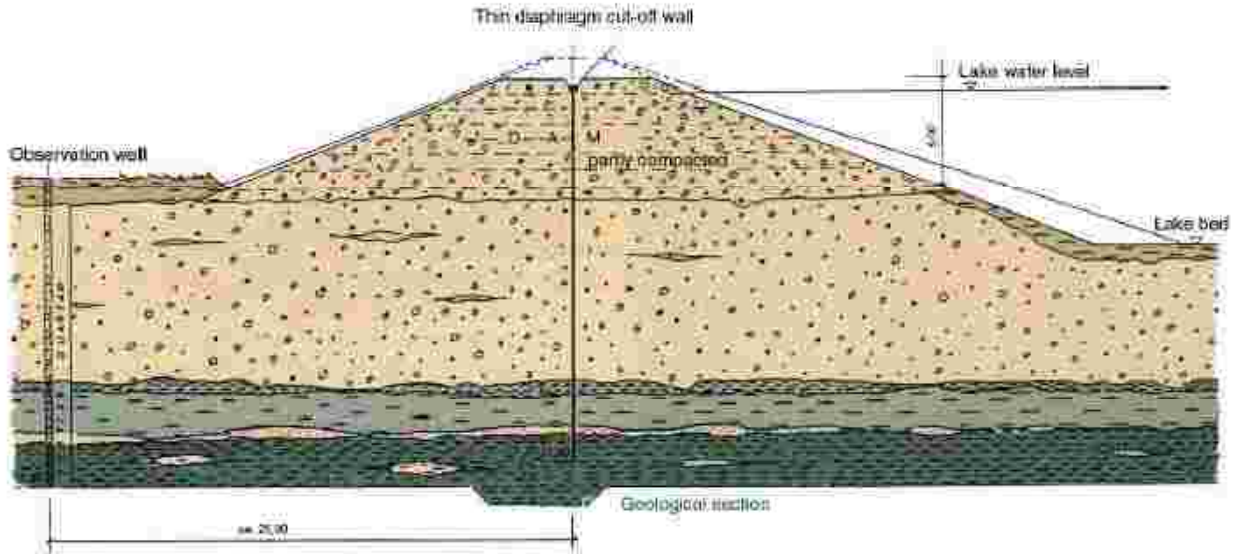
Cross-section through embankment after installation of vib-wall type cutoff
